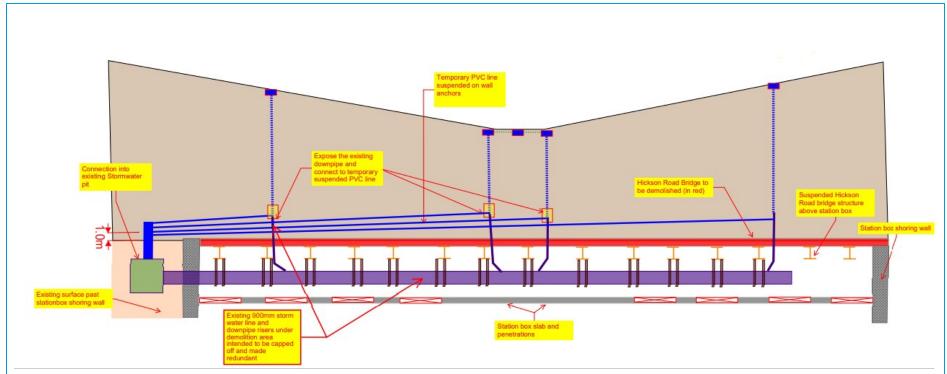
Changes proposed to Hickson Road Wall at Barangaroo site (concept design).
